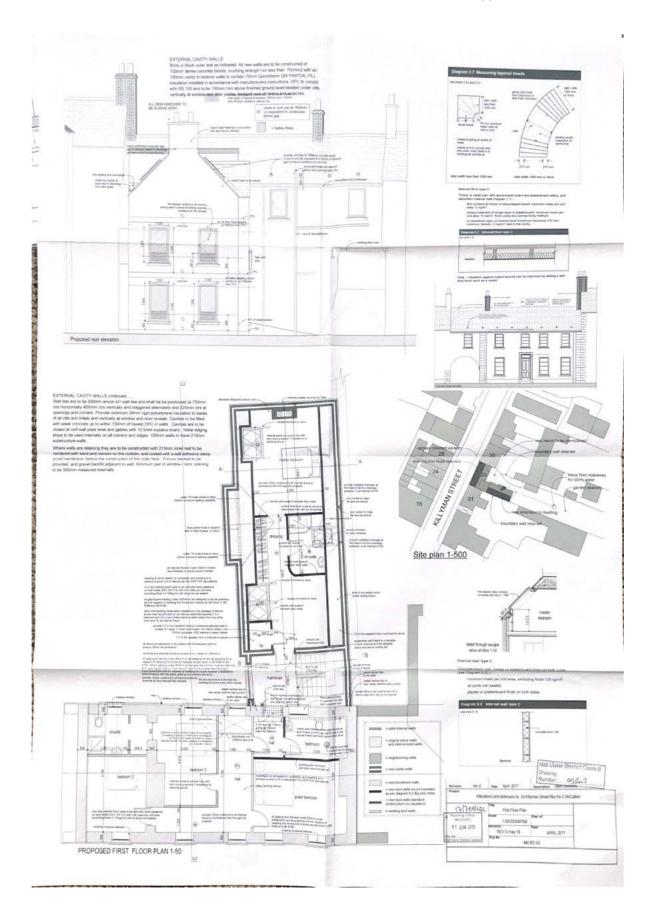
Rev3 Type: Proposed Plans Status: Approved
